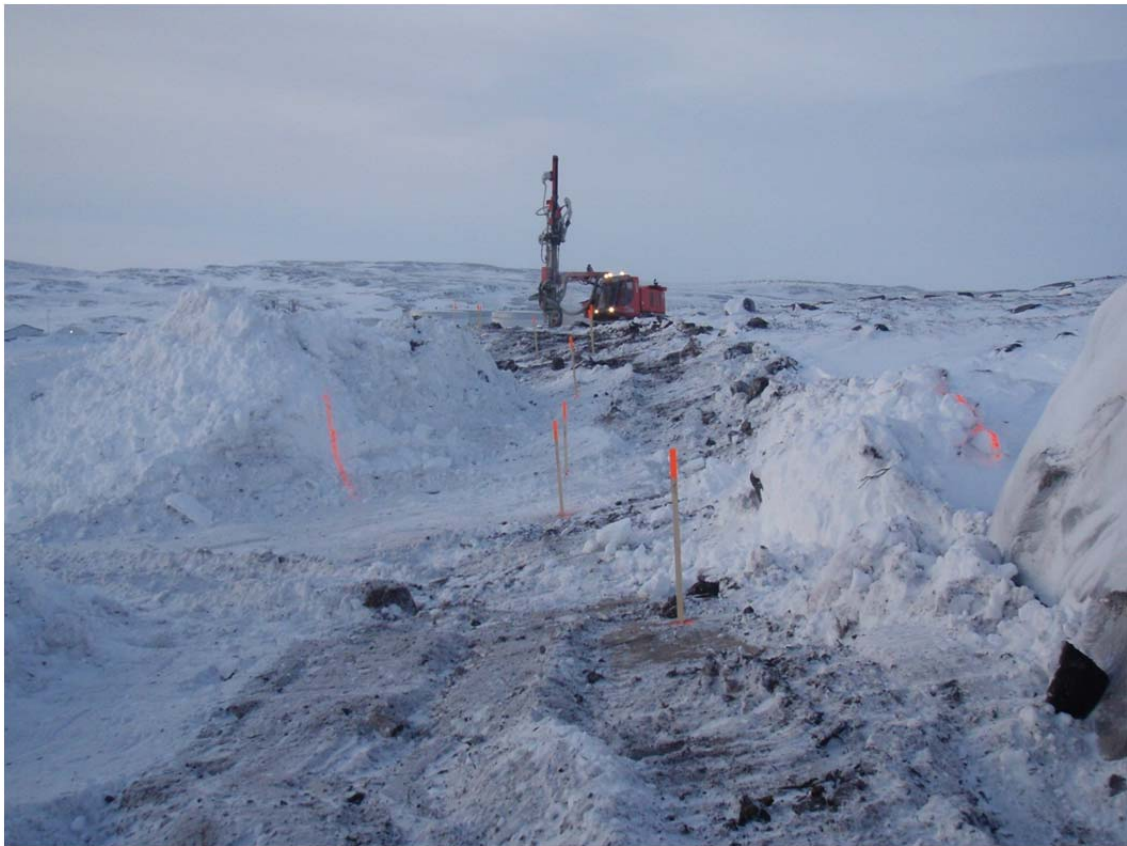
~W view towards WestArc drill drilling bedrock outcrop noted near central east portion of the DN Diversion berm alignment.
